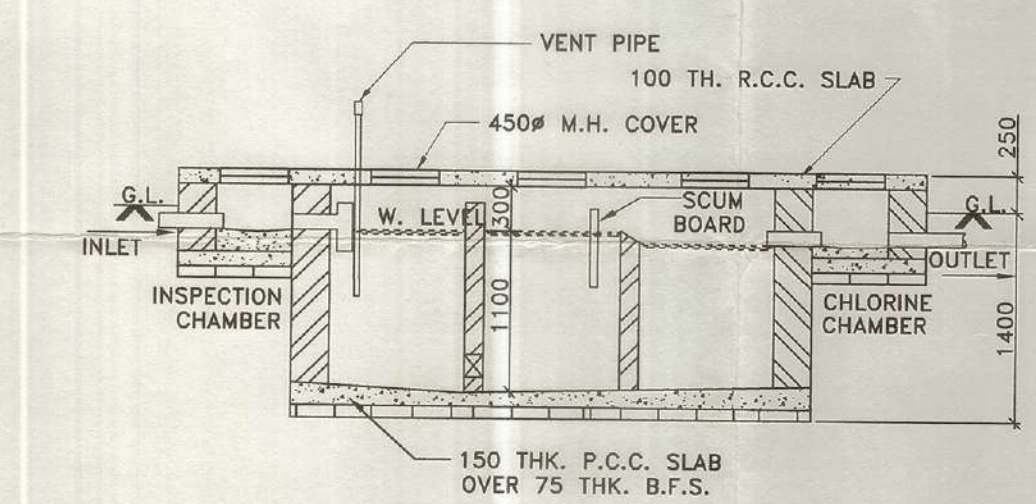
DETAILS OF SEPTIC TANK (50 USERS) SCALE -1:150
